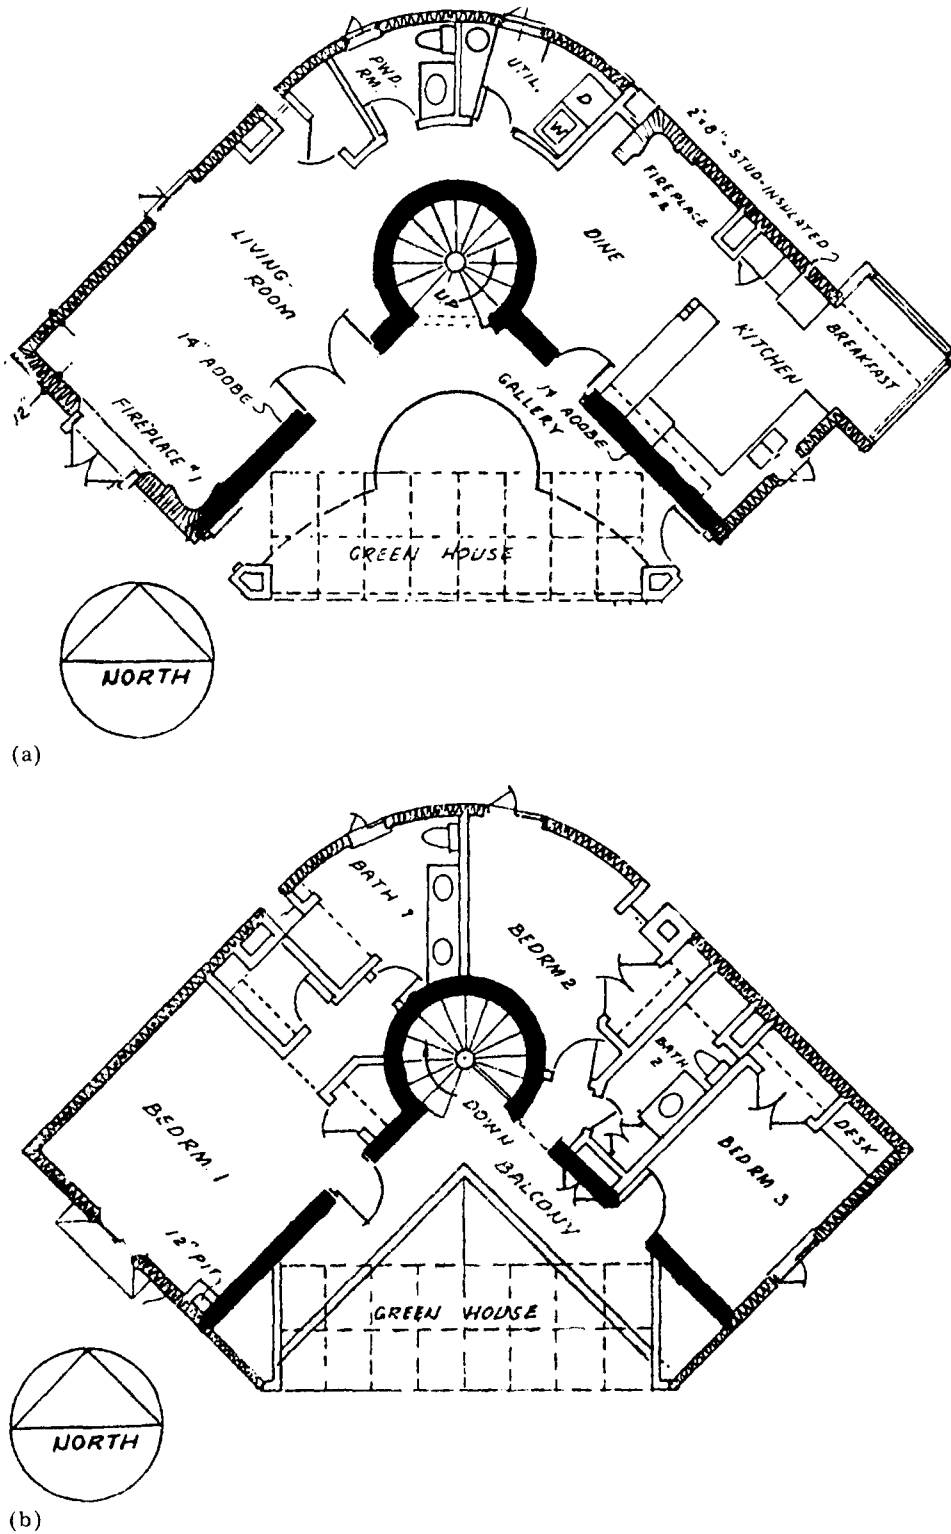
Balcomb House, floor plans. (a) First floor plans; (b) second floor plans.
